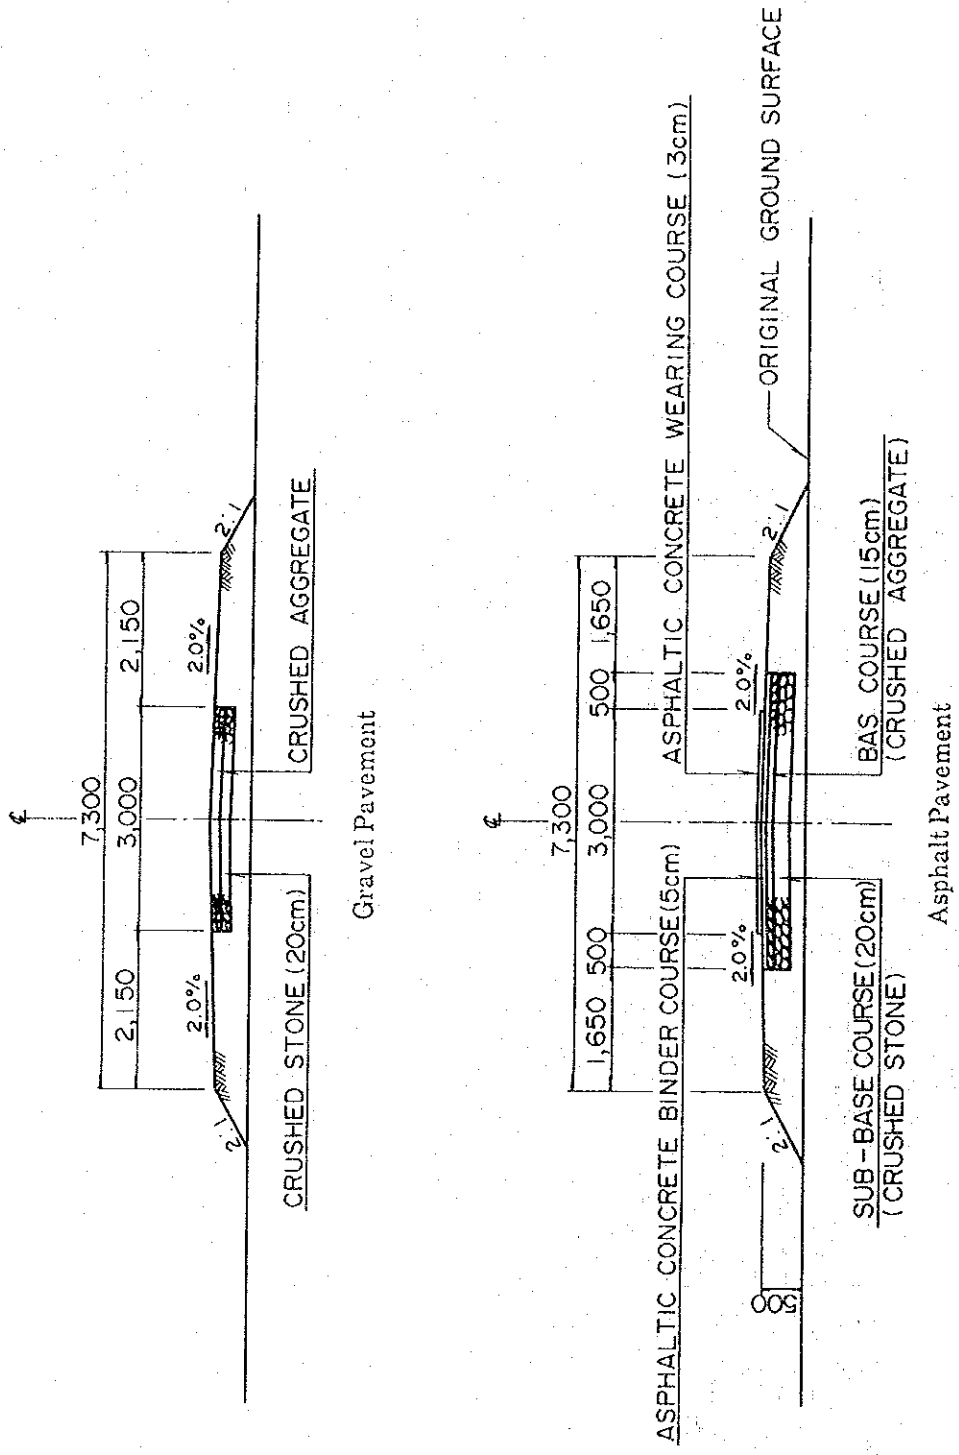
TYPICAL CROSS SECTION OF ROAD
